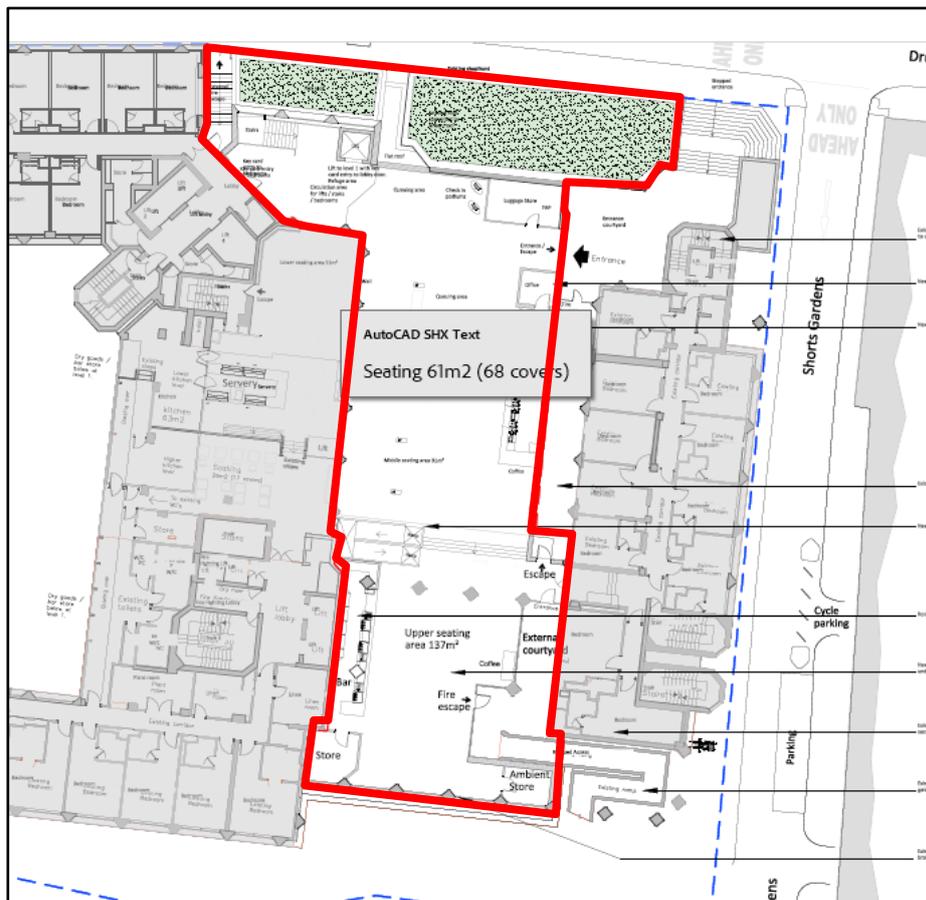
Extract of Architect's Proposed Layout – Level 3
